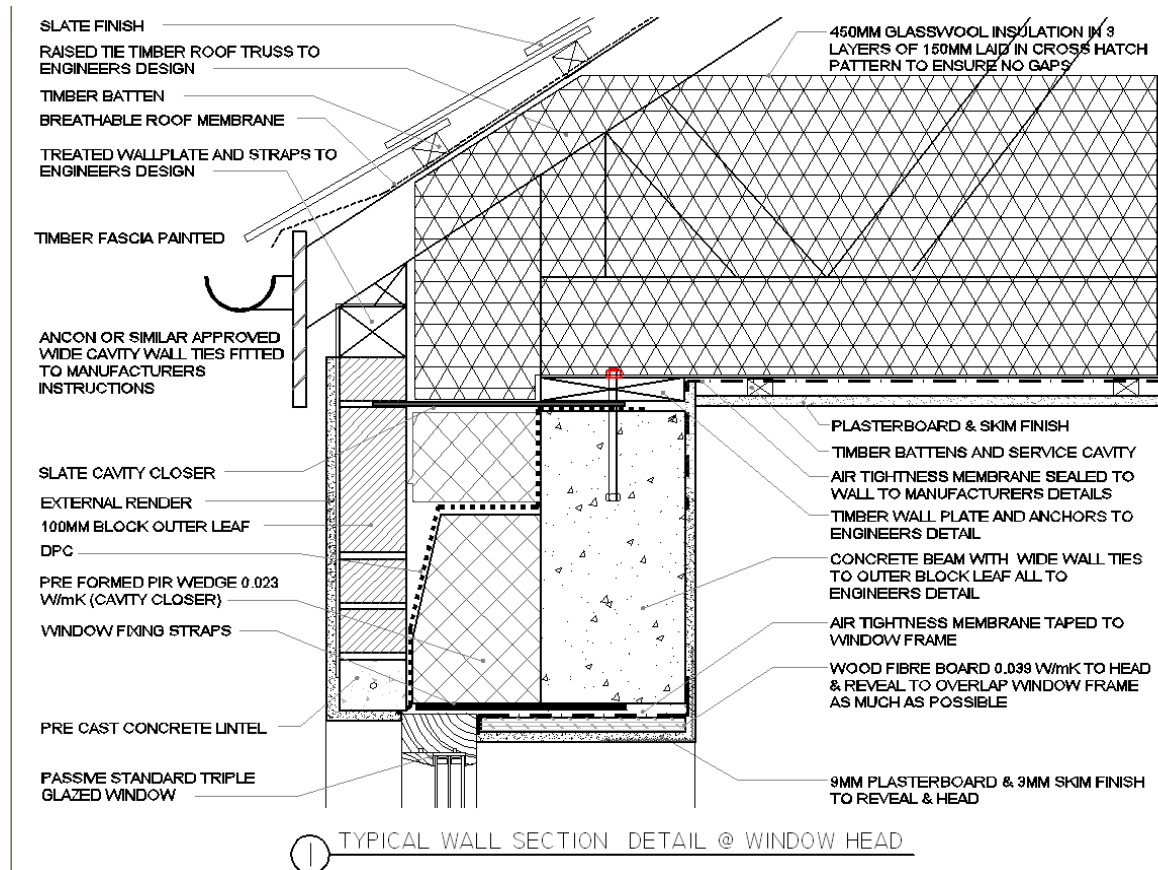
Typical eave to wall section detail at window head - not to scale [Paul Dillon Architects, 2014]
